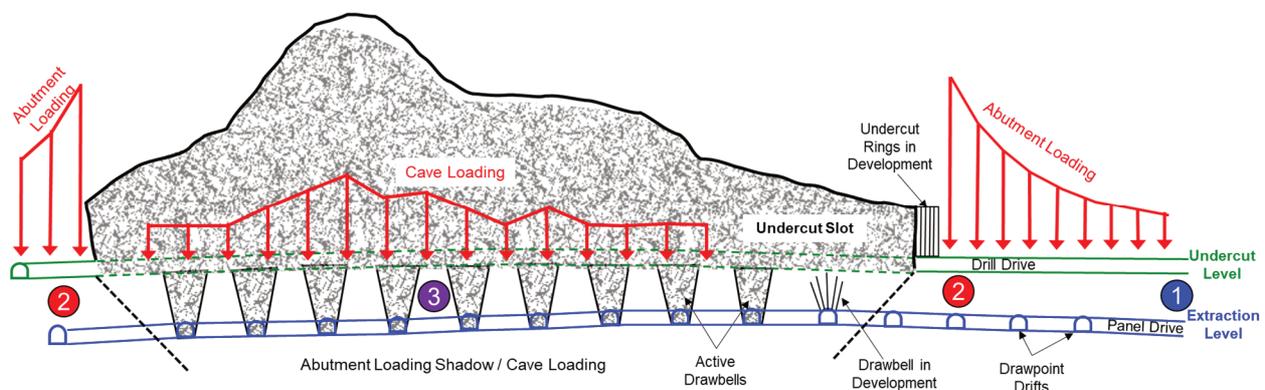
Schematic cross-section through a deep cave mine identifying both the abutment and cave loading conditions
